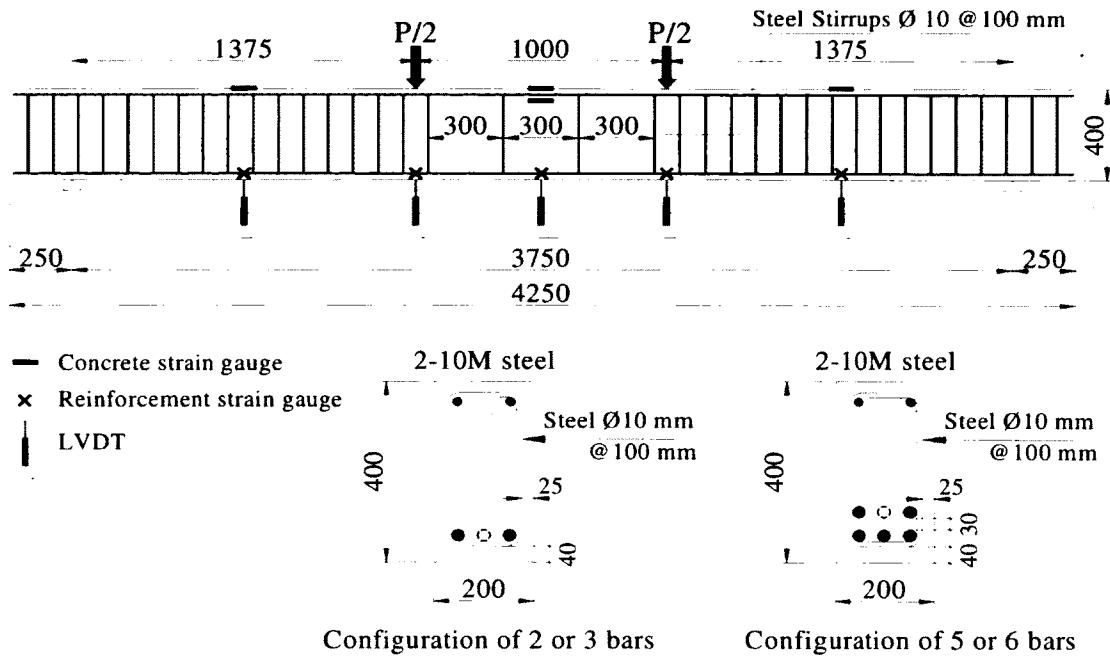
Dimensions, reinforcement details, and instrumentation
